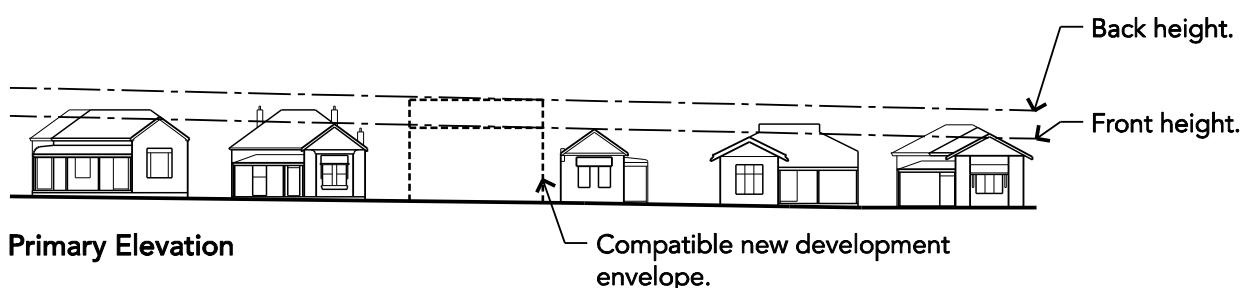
Street elevation illustration compatible roof envelopes – Griffiths Architects 2012.
